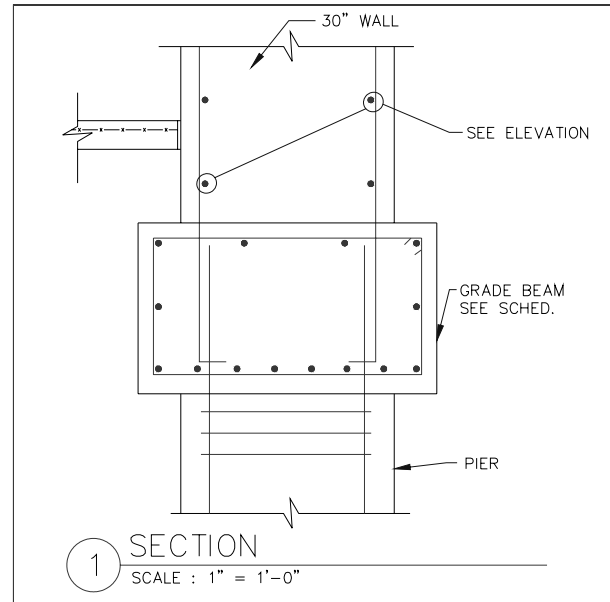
TYPICAL CAISSON & GRADE BEAM W/ FRONT FAÇADE WALL (EMC)
